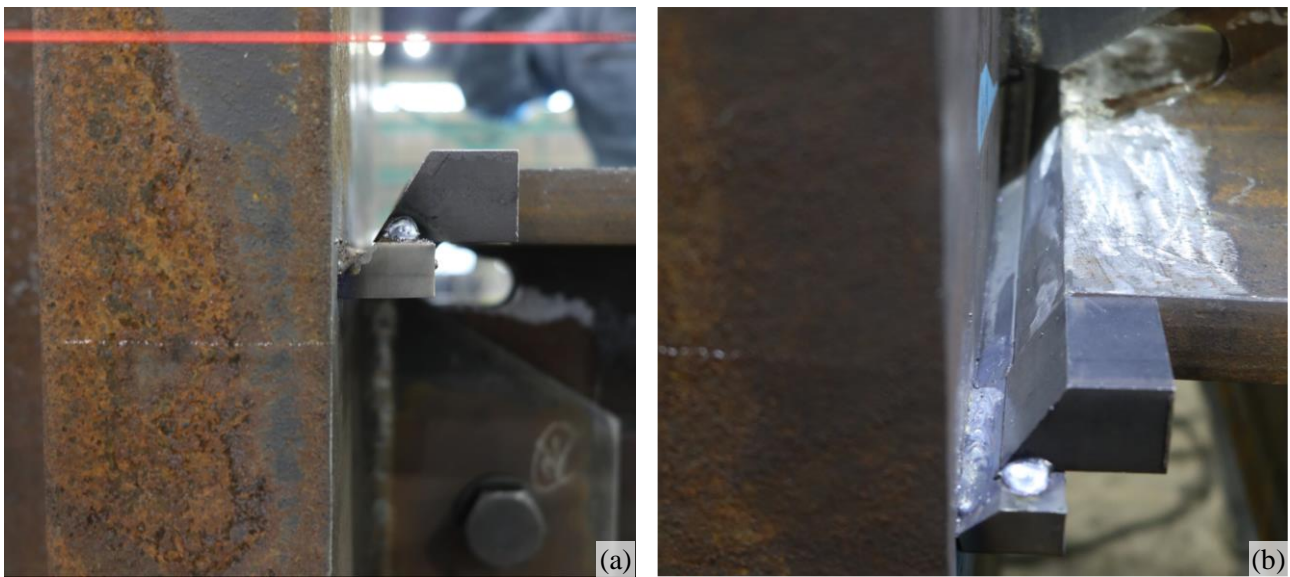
Fabrication of the beam-to-column connection – beveled backing bar details.
